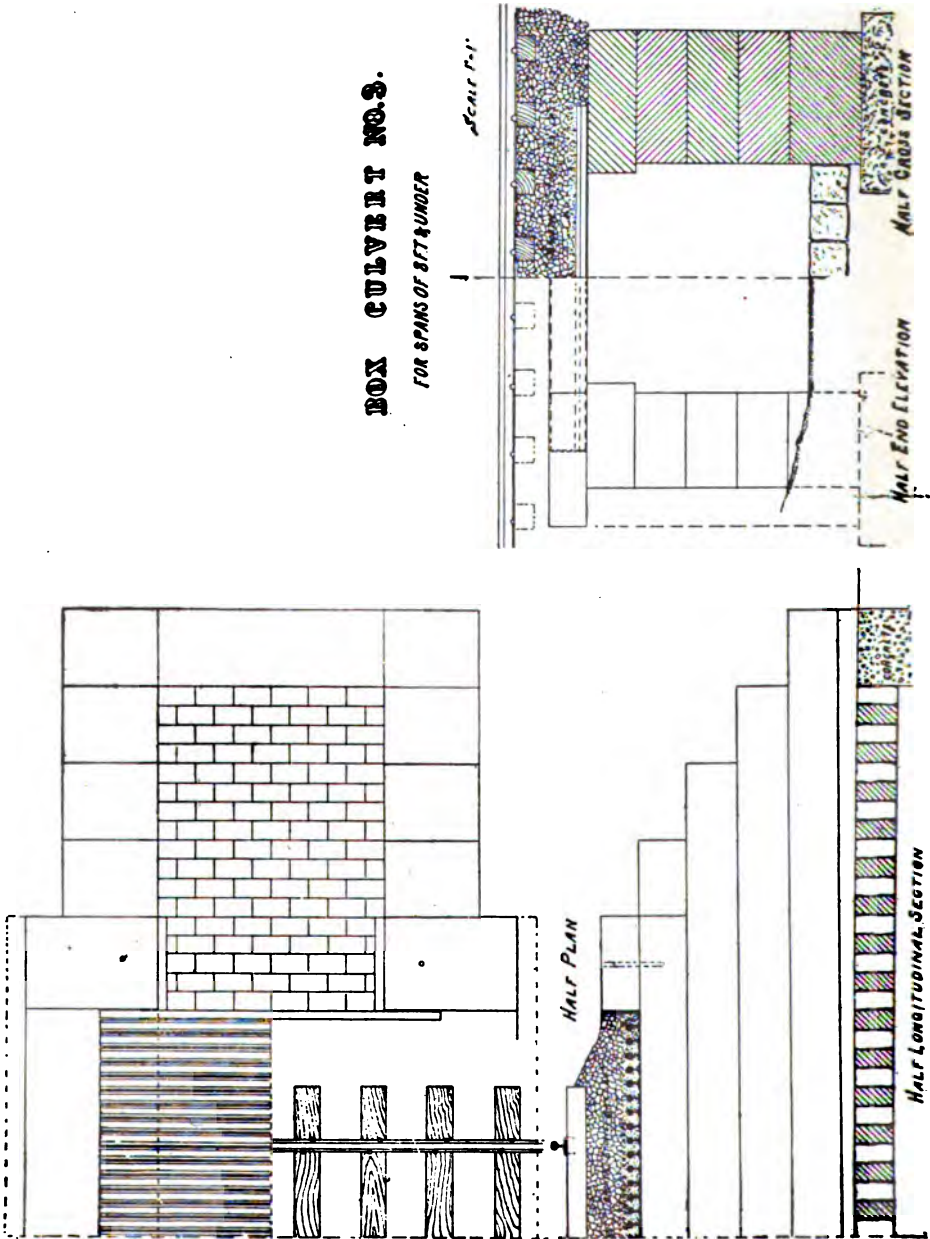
(CONTINUED)—BALLAST FLOOR CULVERT BRIDGE.
